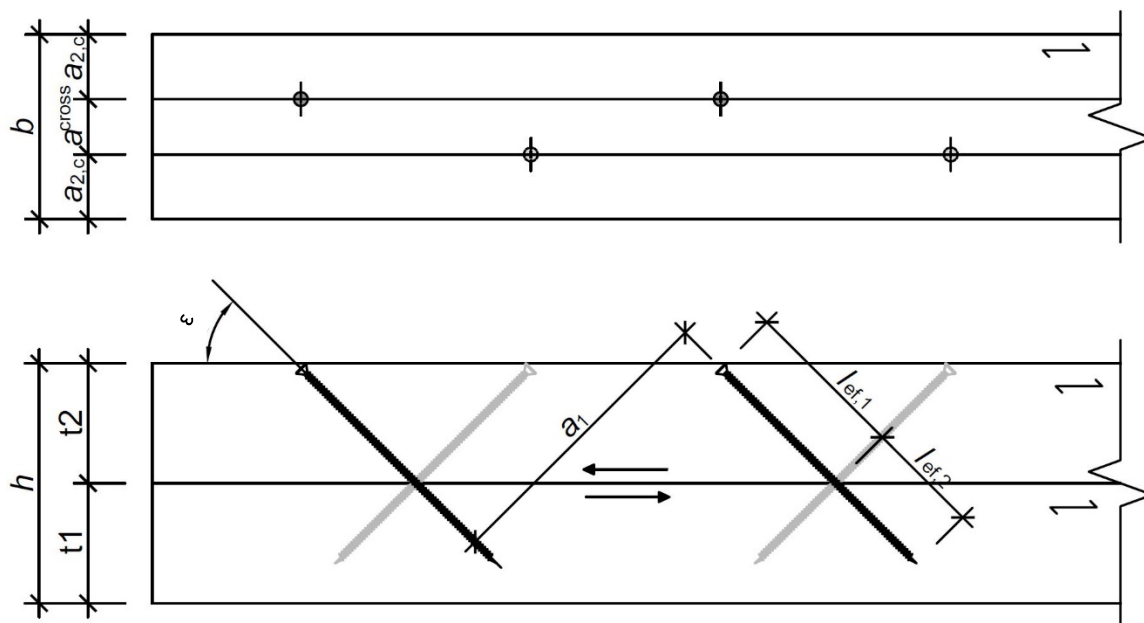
Example of flexible jointed bending beam or ribbed plate
